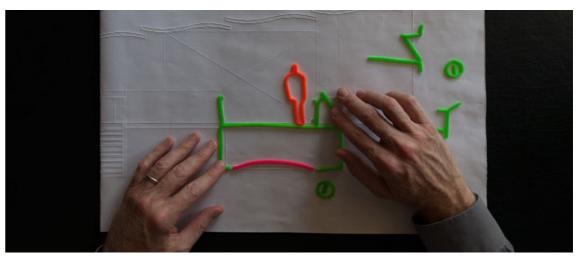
Wax stick sketch on embossed section drawing of lobby Bridge. (Fogg, 2017)
